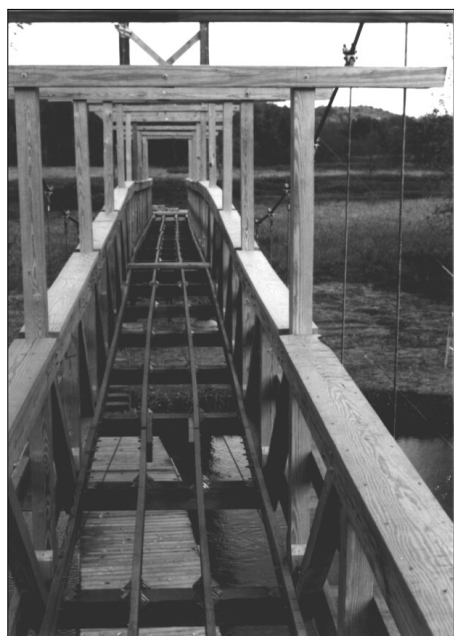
Top view of bridge section connections. *Photo courtesy of Mr. Tibor Latinicsics.
